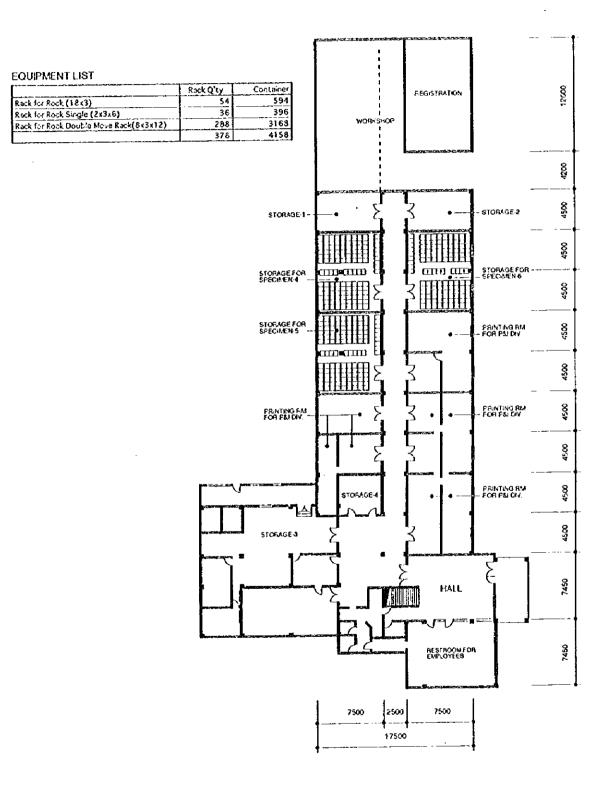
Storage for Specimen 4 - 6 (Basement Floor)
